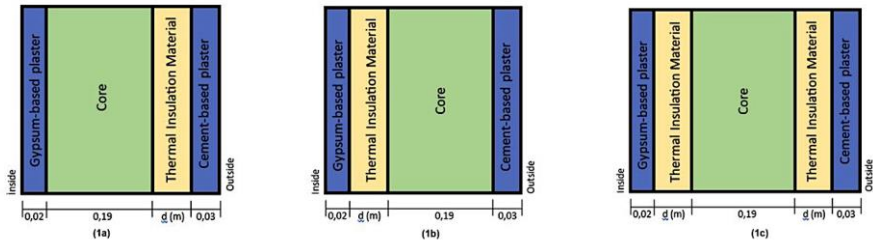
Simulated wall sections: (1a) wall insulated from the outside; (1b) wall insulated from the inside; (1c) wall insulated from the outside and inside.
